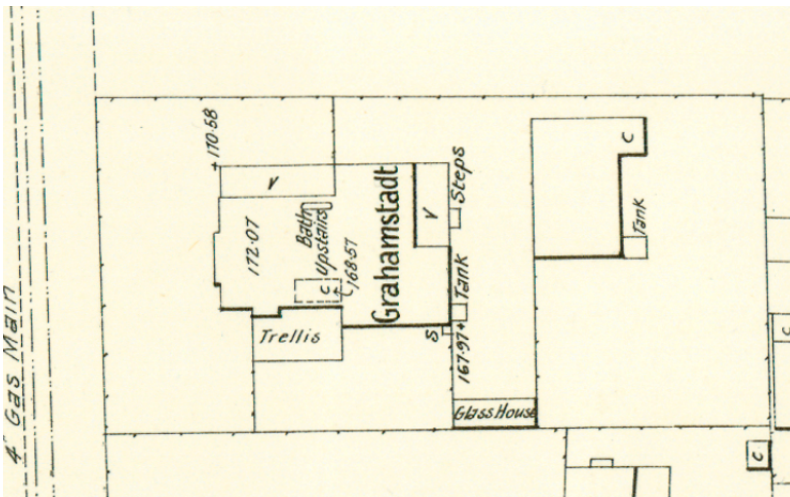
MMBW Detail Plan No. 1744 showing the residence and additional buildings at 5 Harvey Street, Malvern, 1902 (SLV)
